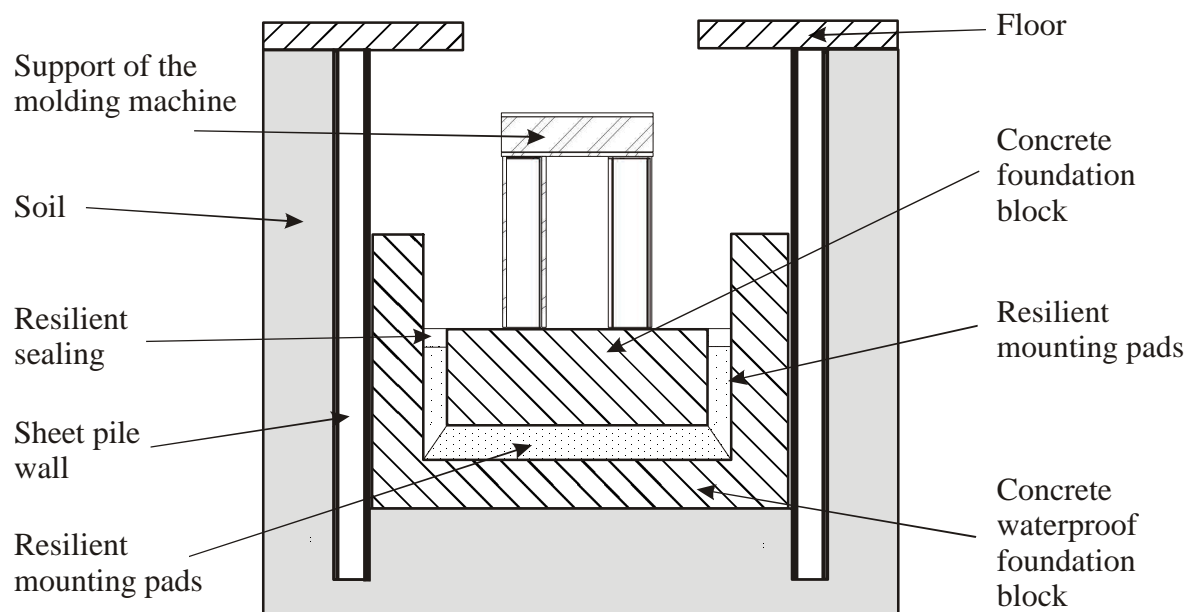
Cross section of the designed vibration-insulated system for the molding machine (not to scale)
